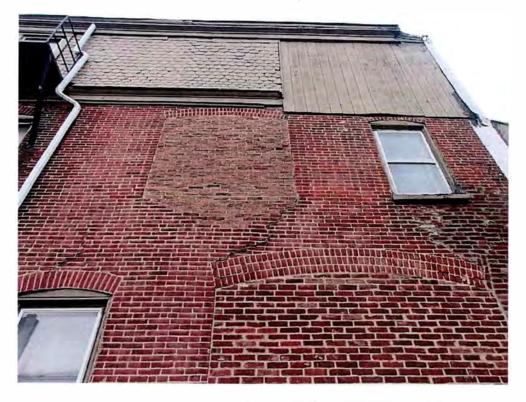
Wall displacement/cracks along south face of 808/810 N. Adams Street
